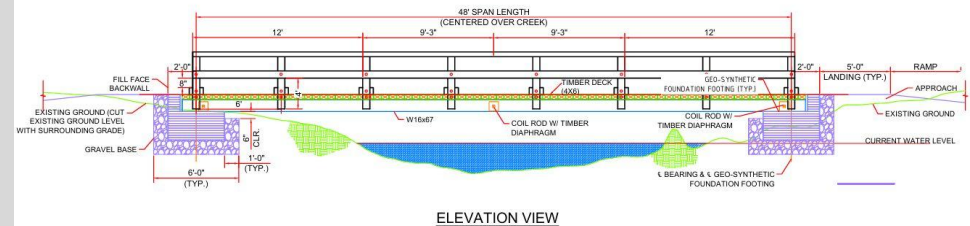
A side view of the temporary bridge design complete with railing, foundation and bridge superstructure. The bridge is designed to carry an ambulance (20,000 lb) traveling at 3 miles per hour.
